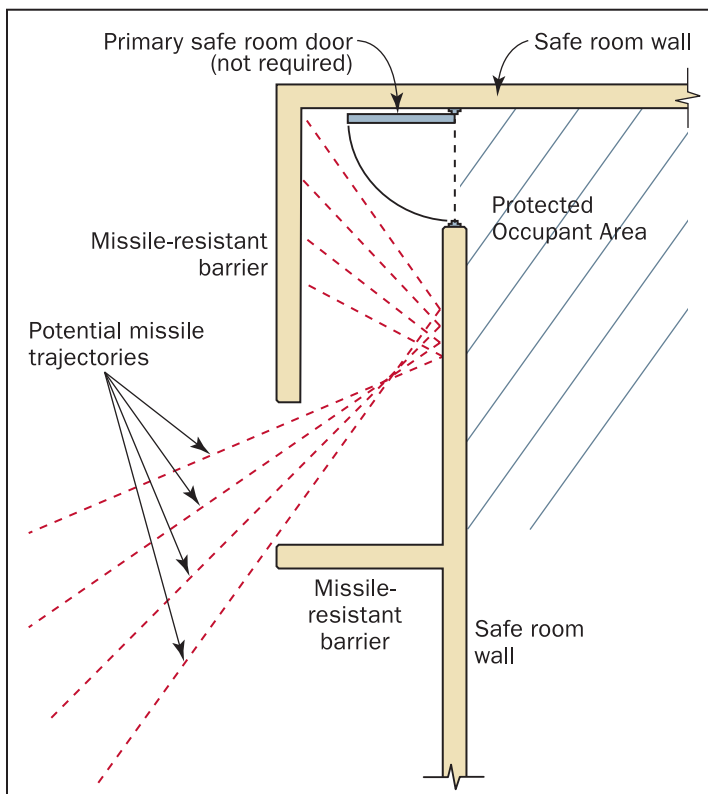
Primary safe room door protected by a debris-resistant barrier (note that the safe room roof extends past the safe room wall and connects to the top of the debris-resistant barrier to prevent intrusion of debris traveling vertically)
